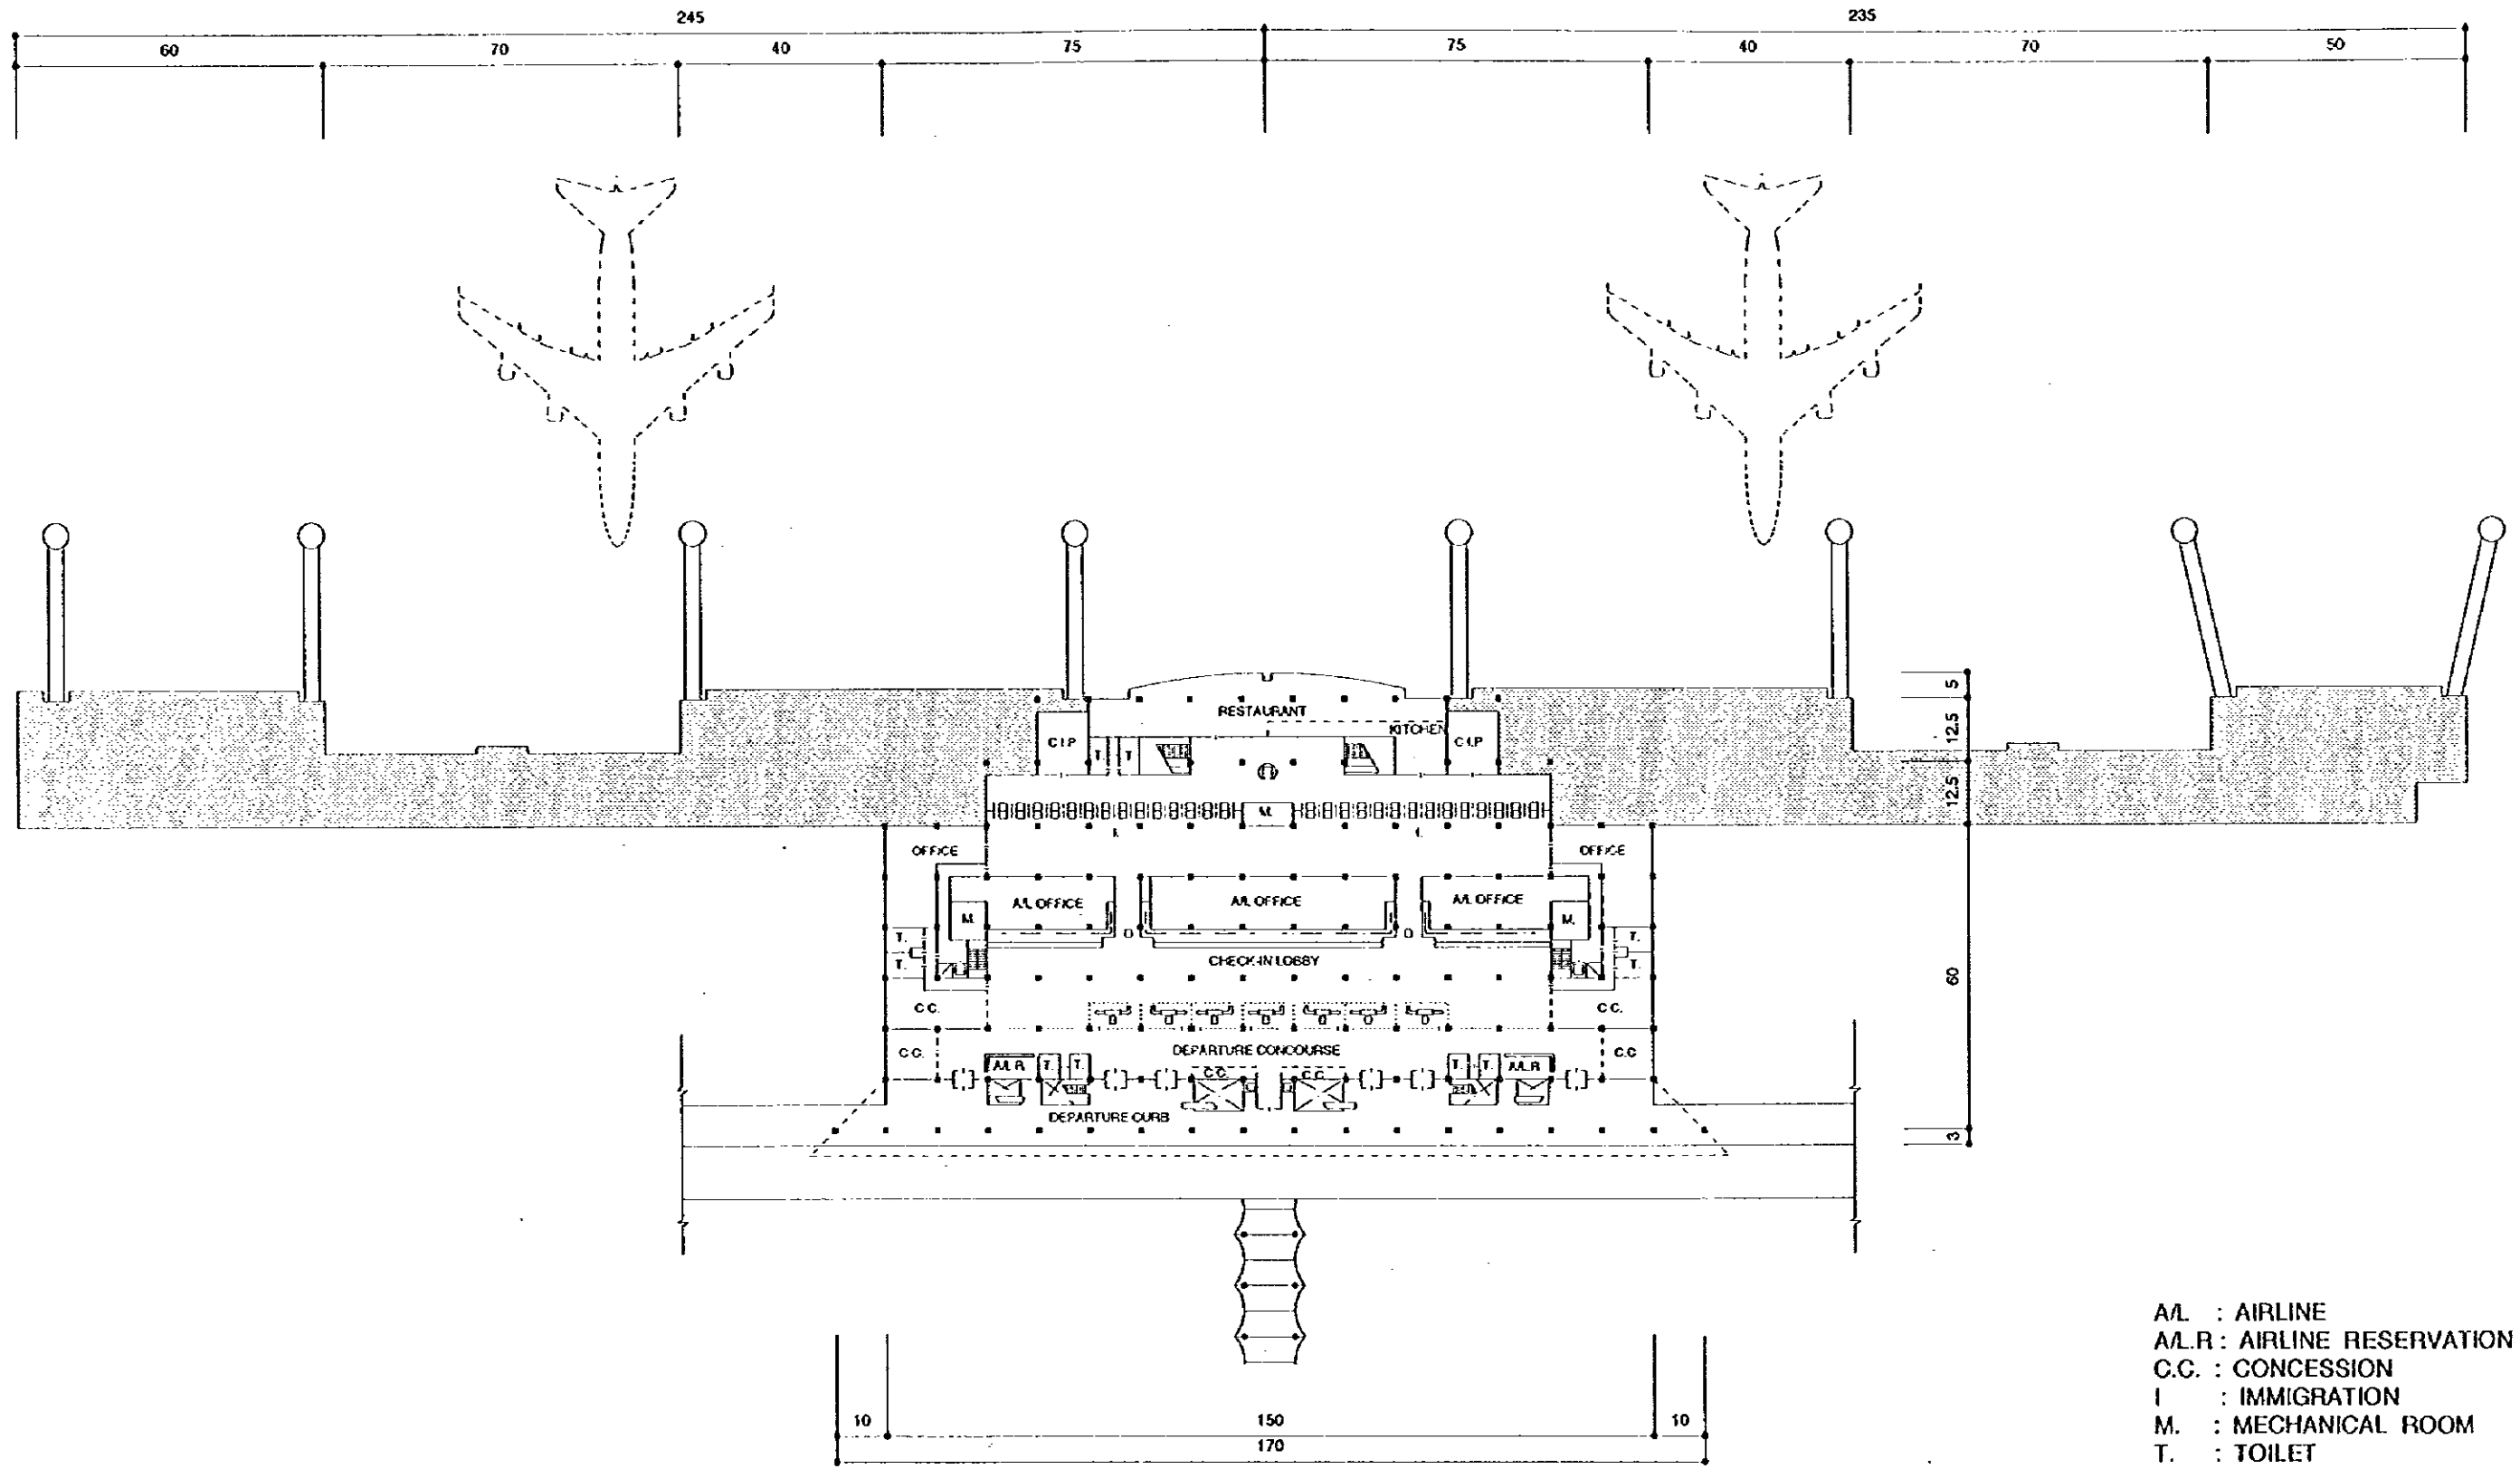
Floor Plan of International Passenger Terminal Building - First Floor
